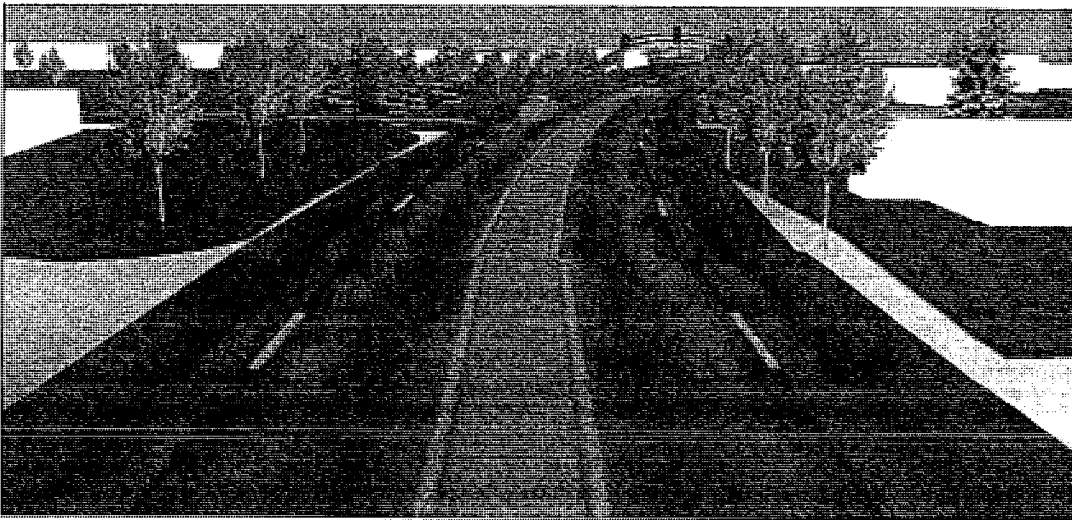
This view is Option 1 looking south near the 14th Avenue and Washington Street intersection on Lincoln Road.
